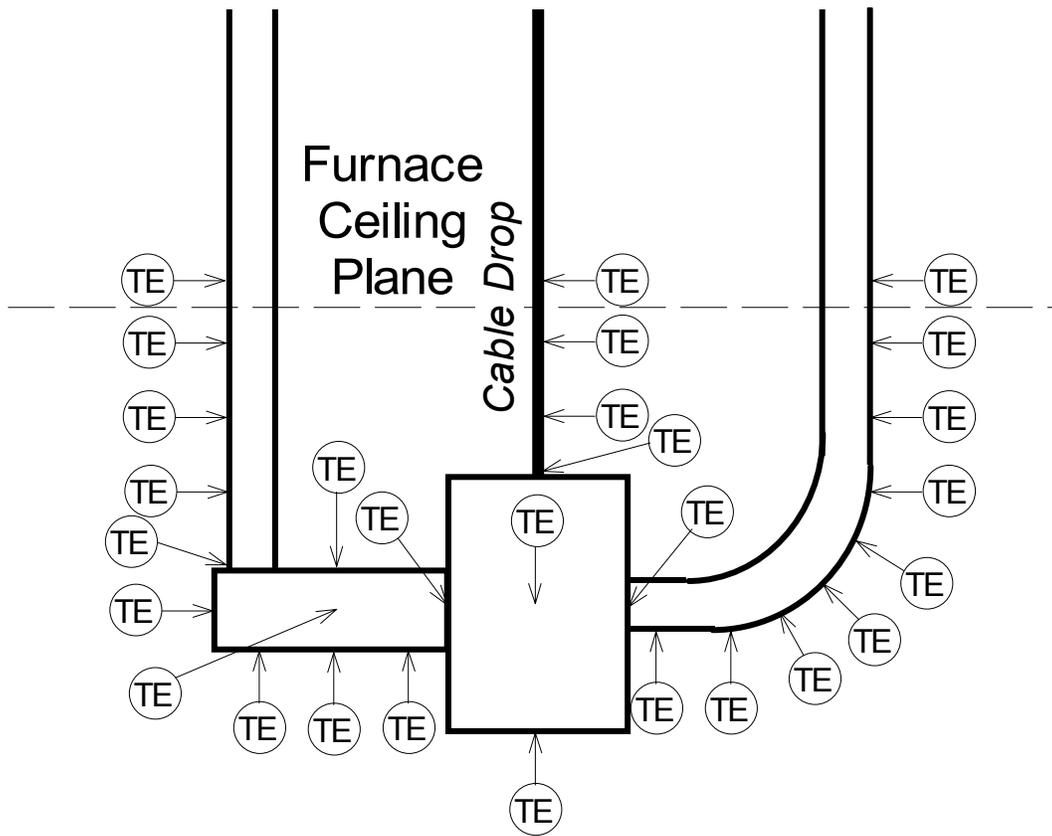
Planned Thermocouple Locations on the 63-mm (2½ in.) Conduit/Condolet LB Test Specimens. Note that at least one thermocouple will be attached to each face of the condolet LB fitting. A single bare copper wire (8 AWG) will be instrumented with thermocouples and routed inside the test specimen.
